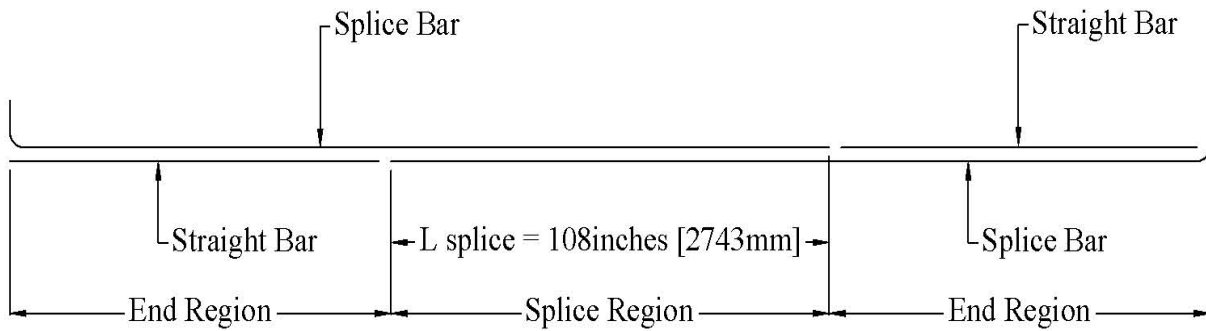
Longitudinal Section of Tension Reinforcing Steel.
